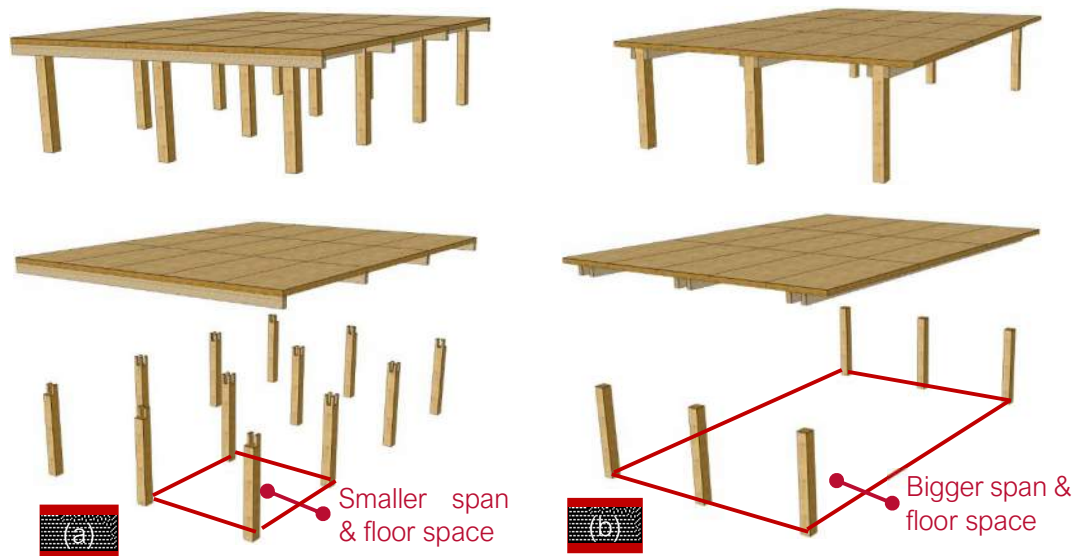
Effect of using Red Stag CLT composite Double Tee beams on structural girders and its impact on floor space and spans; a) post and beam system, b) Red Stag CLT composite beam system.
